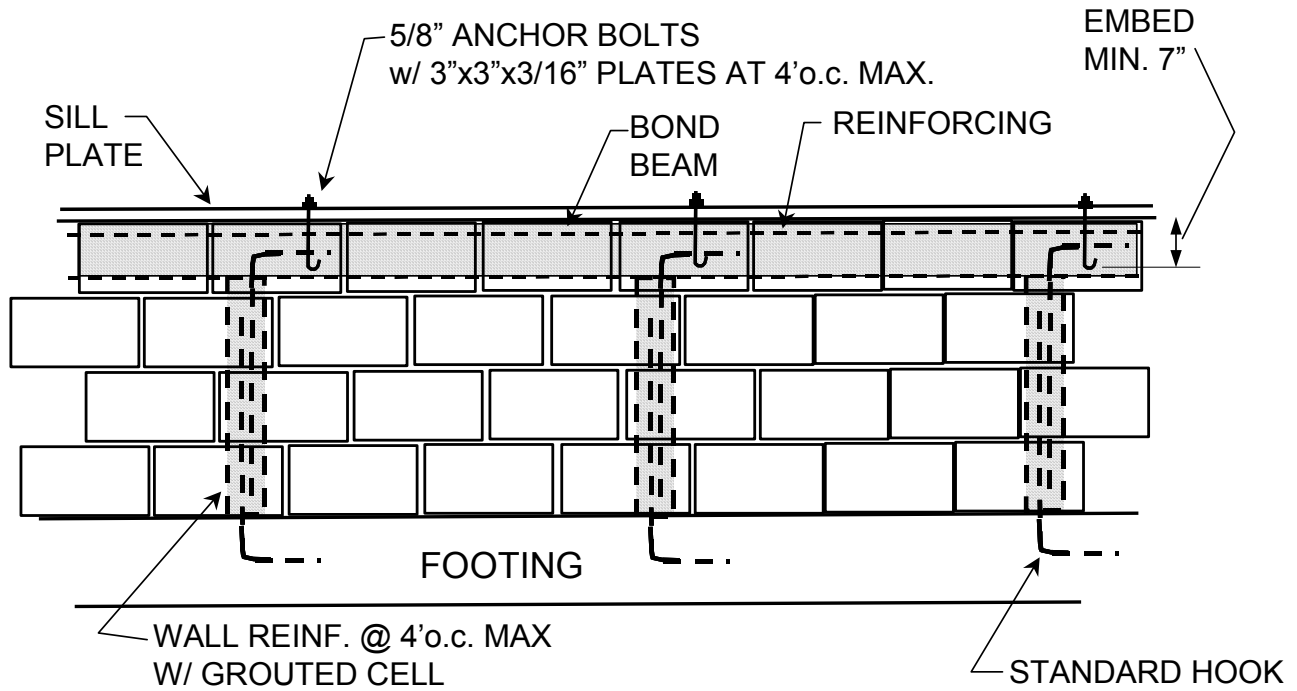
Typical foundation details for wood wall construction. Fortified inspectors are only required to check for proper anchor bolts size and spacing.
